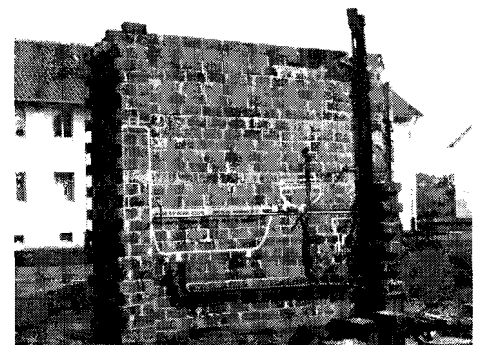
Framework for the accurately dimensioned building of walls for sanitary installations.
